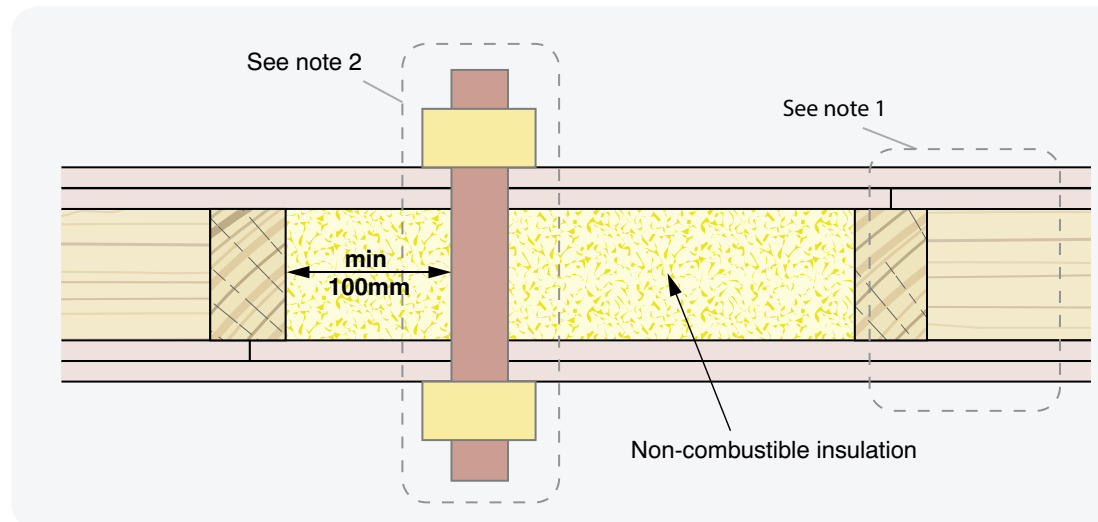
Plastic pipe penetration through fire-protected timber-framed walls with non-combustible mineral fibre insulation.
